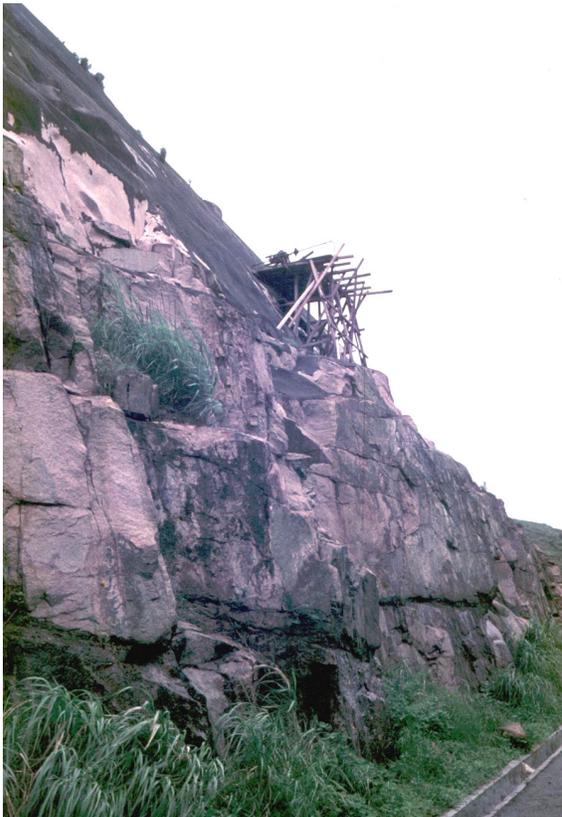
Drilling horizontal drain holes into the face of one of the benches of the Sau Mau Ping slope.
